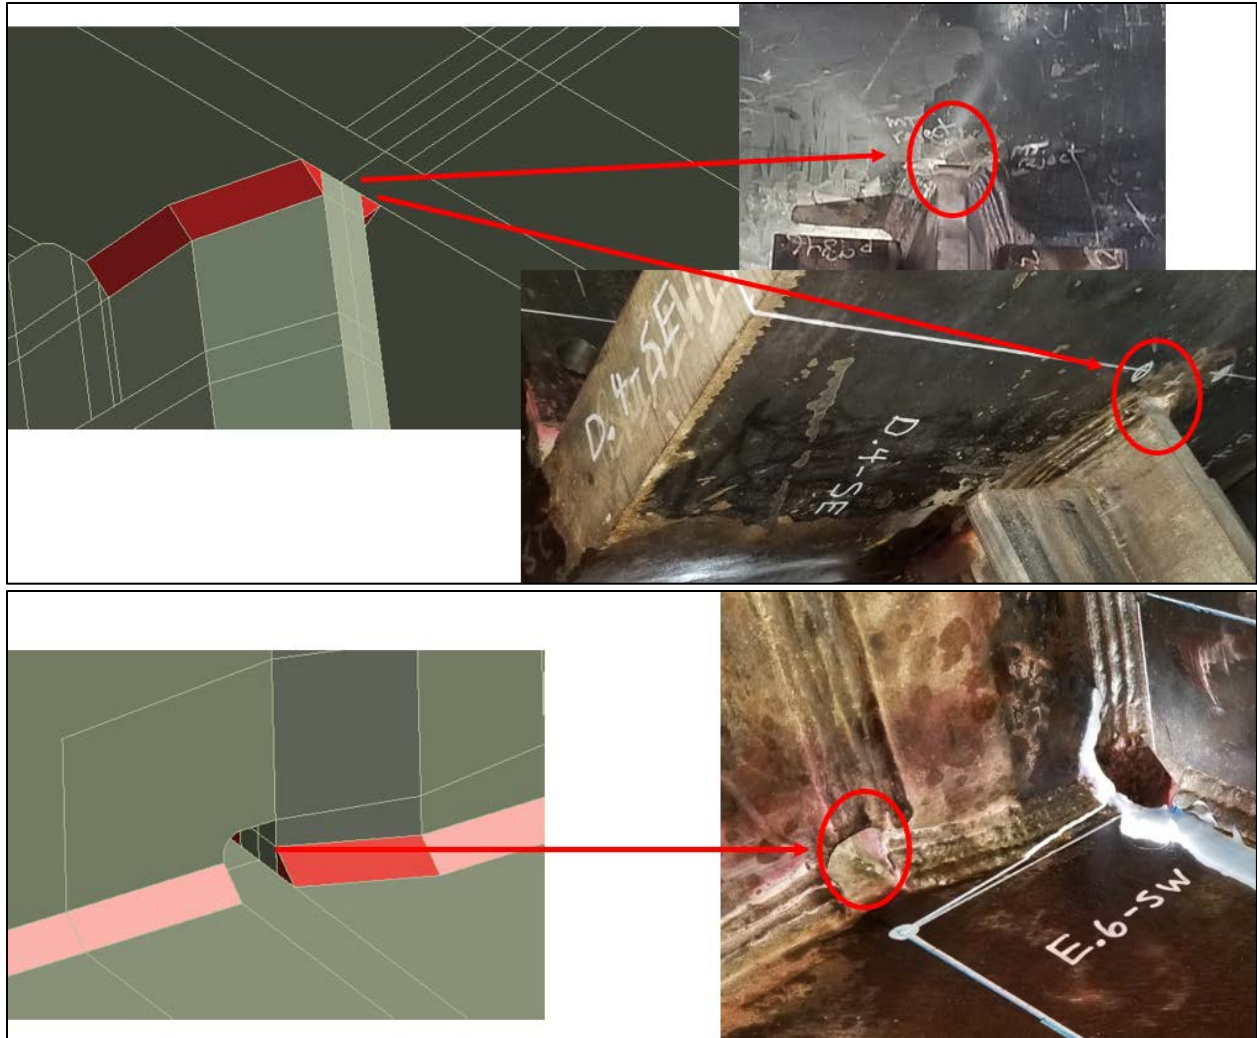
Unwrapped bottom flange fillet welds of the Fremont Street TPG3 girders.
